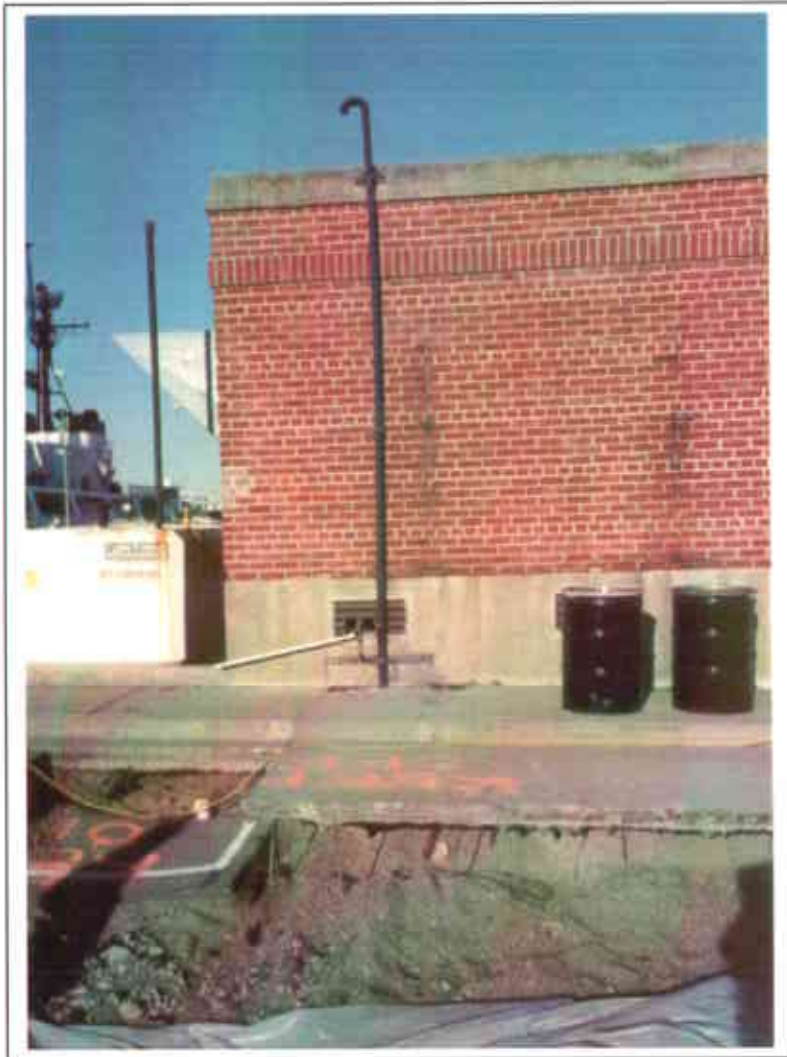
Location of removed piping. Black marks at the wall indicate former location of piping.
